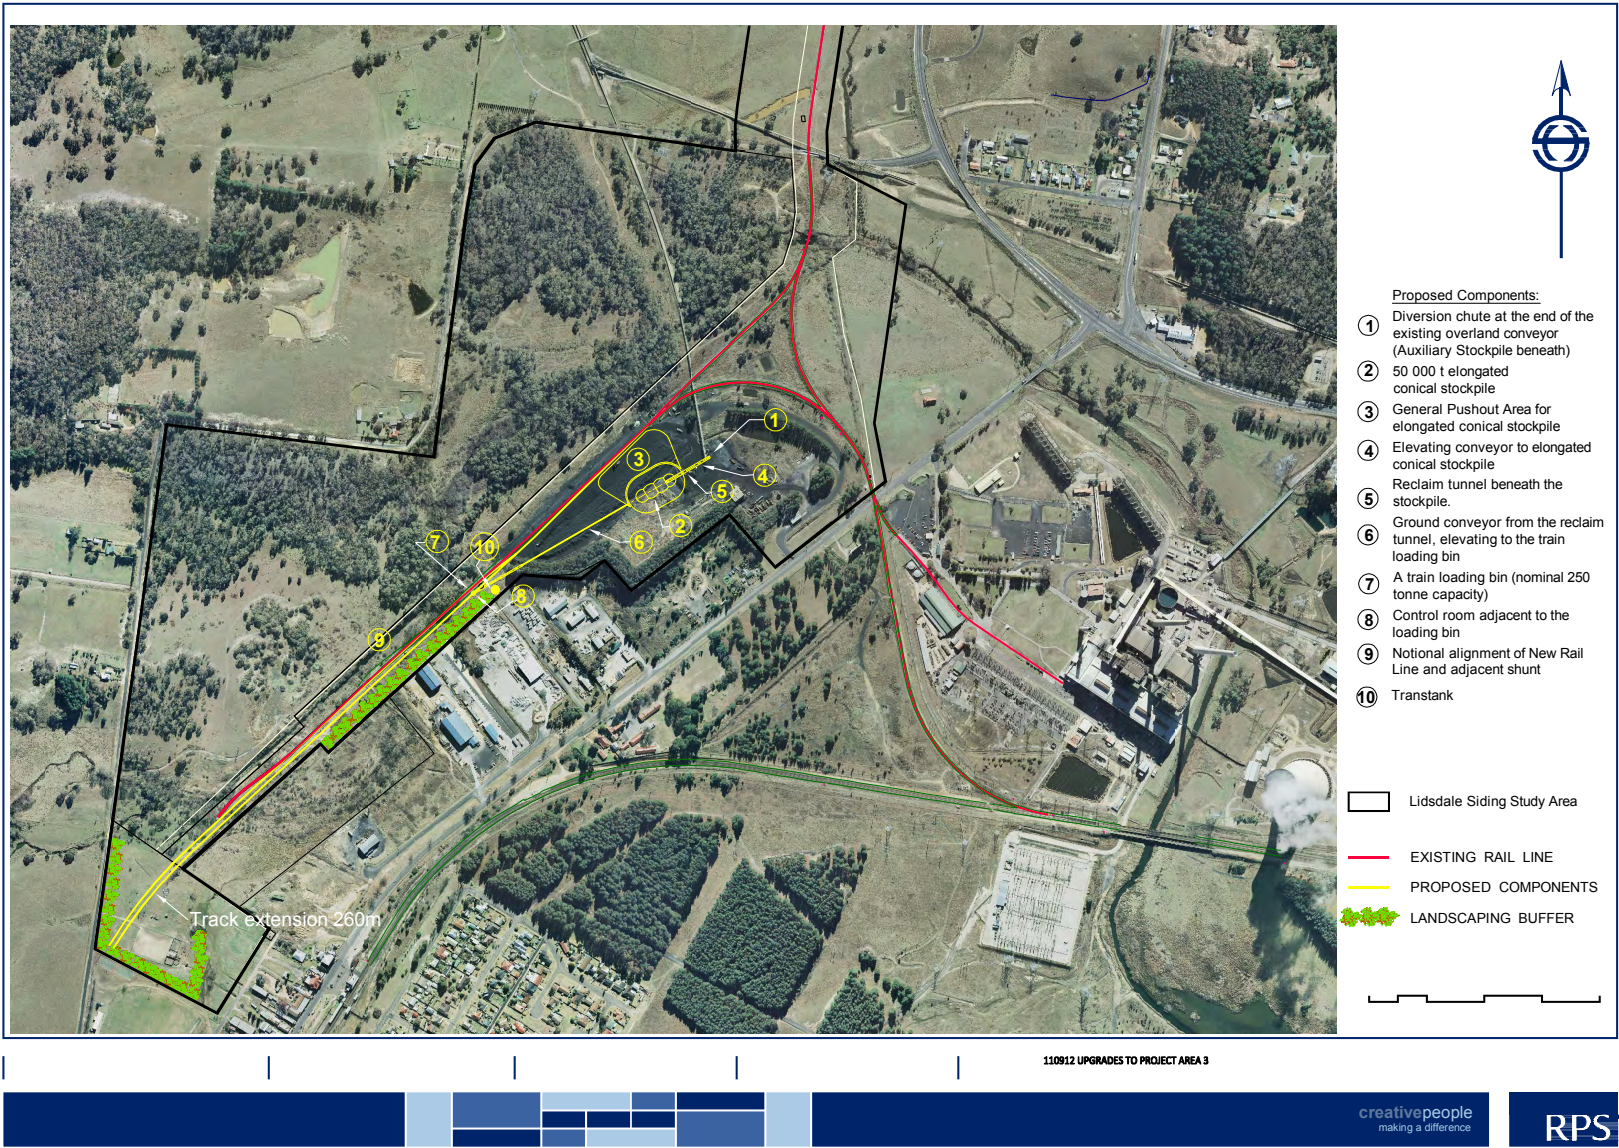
Plan showing Lidsdale Siding Upgrade Project
